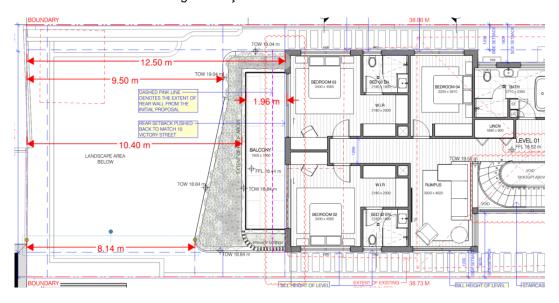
Proposed dwelling first floor plan with setbacks marked in red - 8 Victory Street, Clovelly (Source: BJB Architects Pty Ltd)
